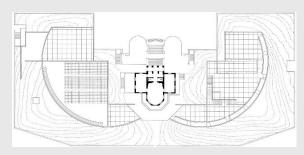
Beelden aan Zee floor plan ground floor (Quist Architekten, n.d.)
